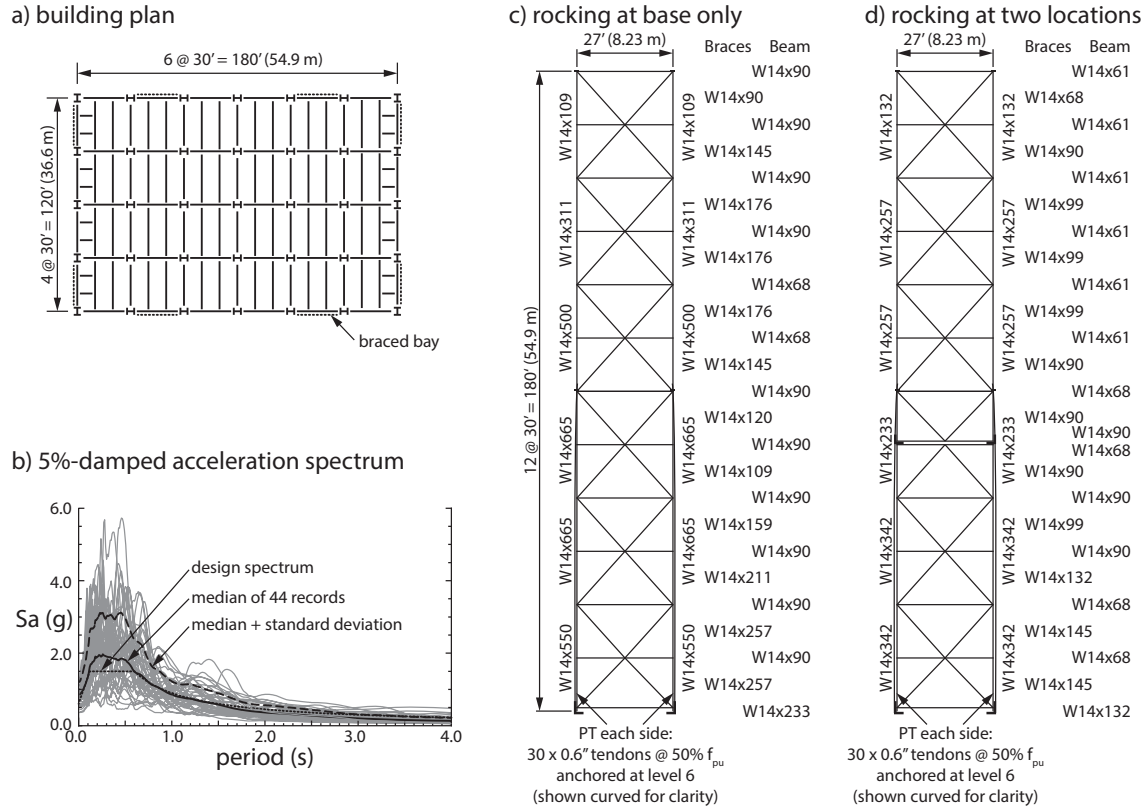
Example design: (a) building plan; (b) 5%-damped acceleration spectrum; (c) summary of design with rocking at base only (US section sizes); (d) summary of design with rocking at two locations (US section sizes).
